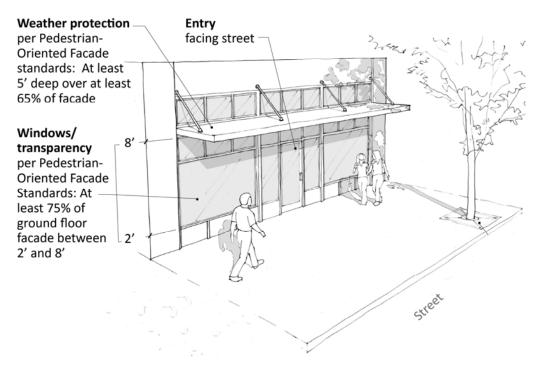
F.2.a An example of a pedestrian-oriented façade.
